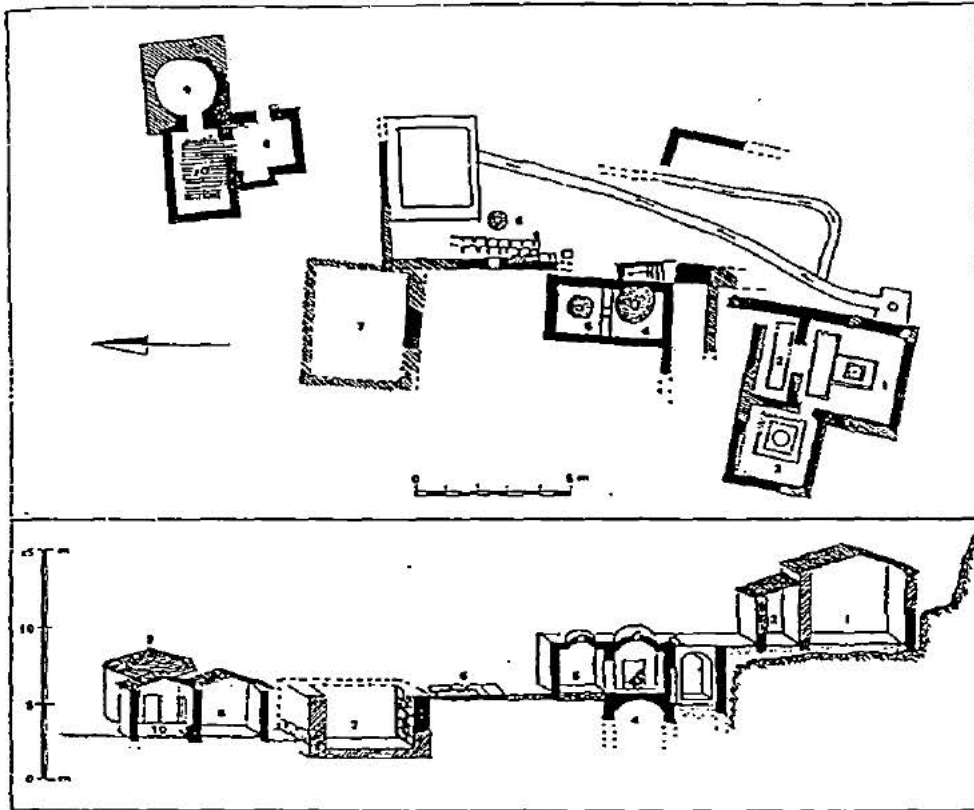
'En Ya'el, Roman mansion, plan and section
